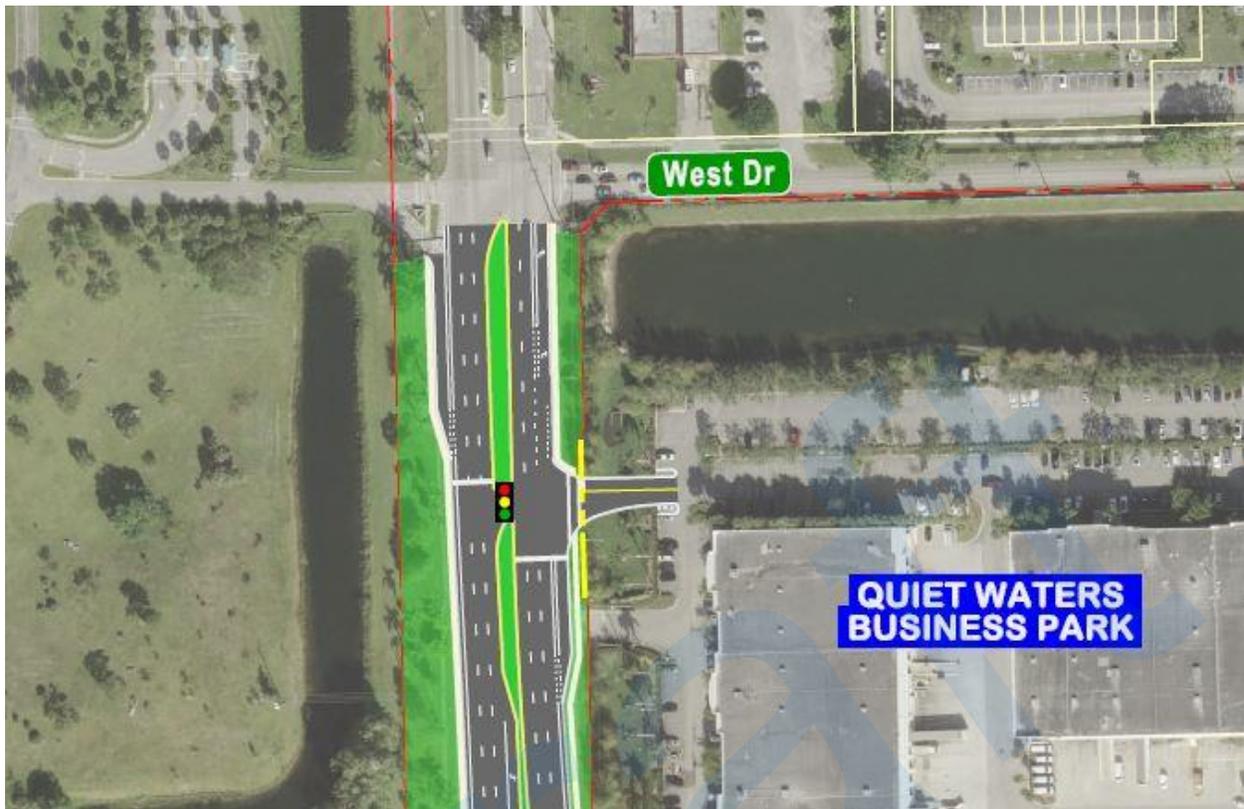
SW 10th Street at SW 28th Avenue Intersection
